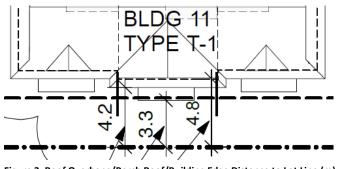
Roof Overhang/Porch Roof/Building Edge Distance to Lot Line (m)
